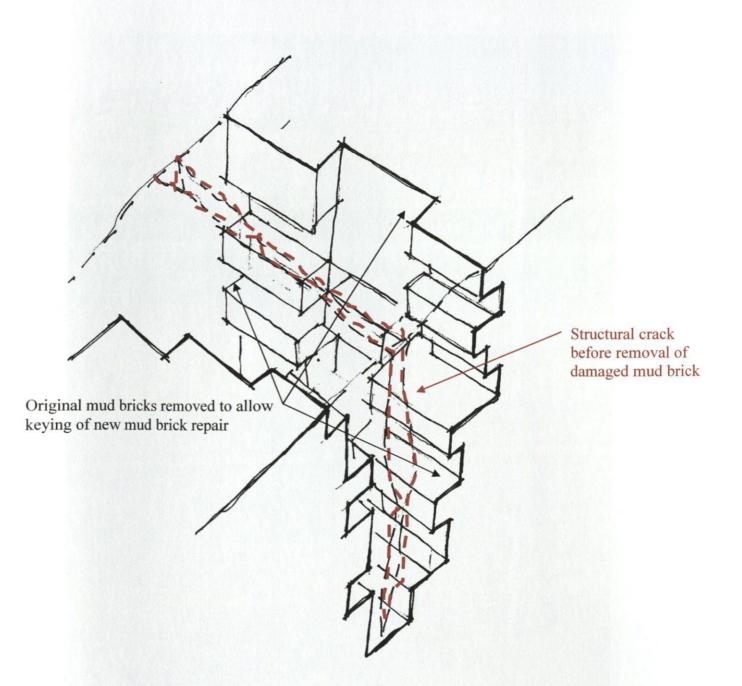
Sketch showing schematic of the removal of section of mud brick masonry at a crack in preparation for the reconstruction of the area with new mud bricks.
